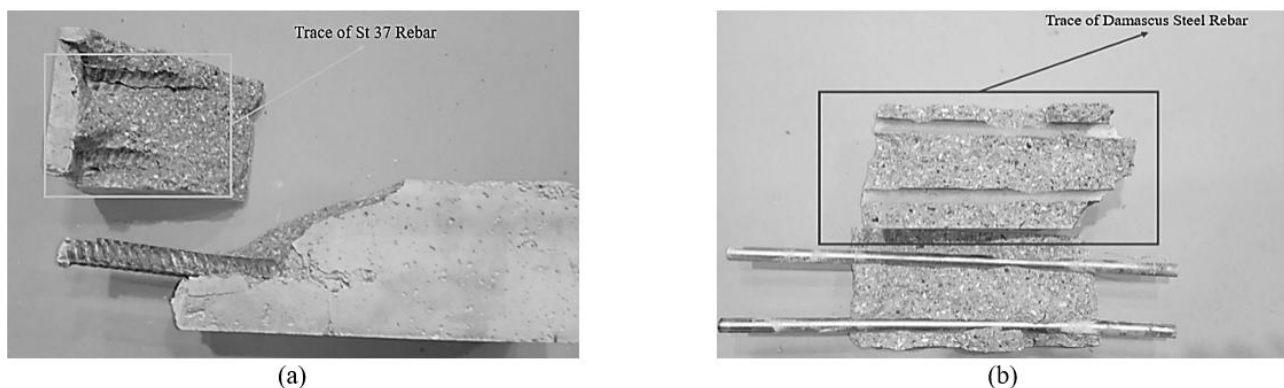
Trace of rebars inside concrete: *a* — St 37 steel rebar; *b* Damascus steel rebar
